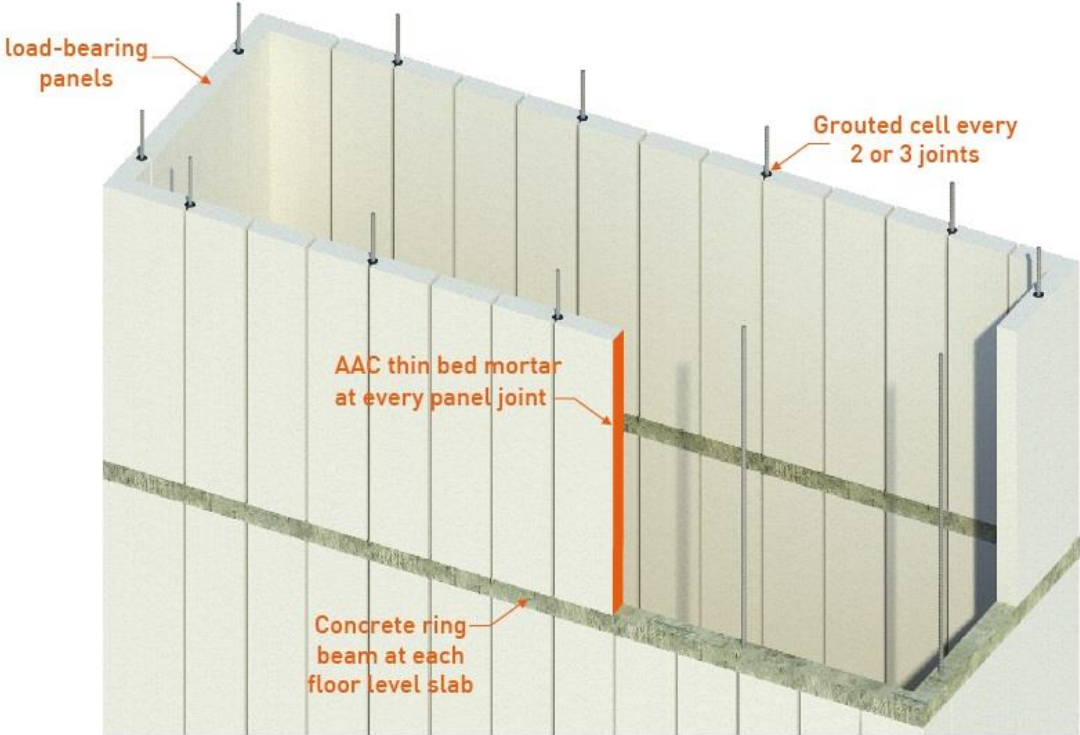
AAC Panel Construction Details (Xella, 2010)
